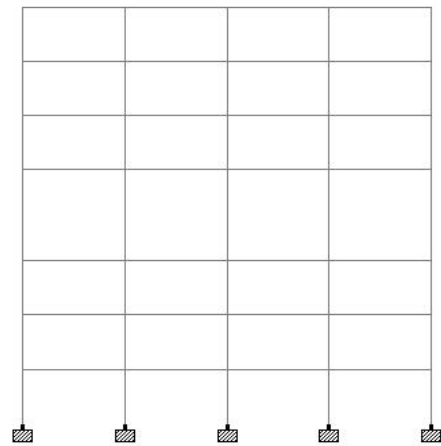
elevation view of building with soft story at middle in STAAD.Pro
